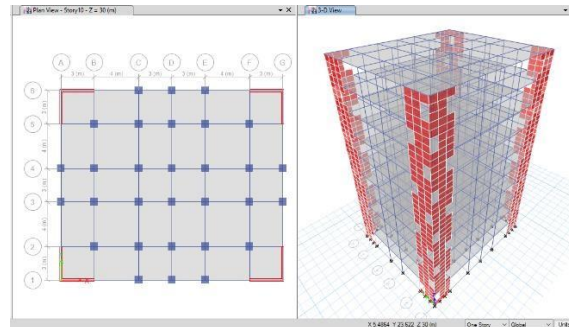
Plan and 3D view of model with corner shear walls with zigzag openings
